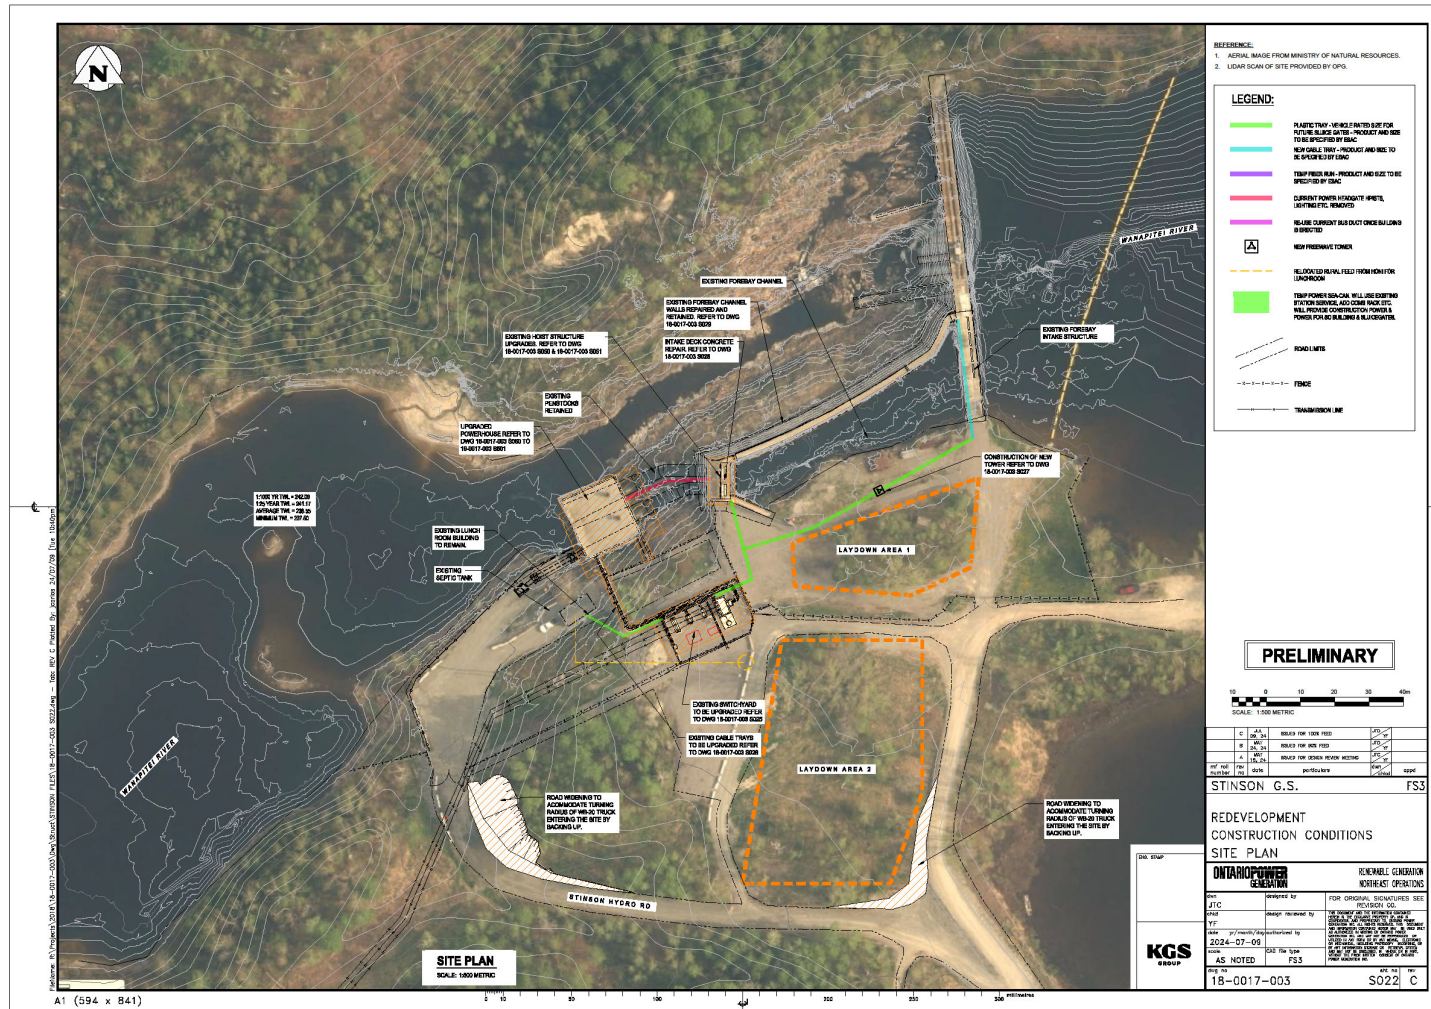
Proposed General Arrangement Site Plan for Construction for the Stinson GS
